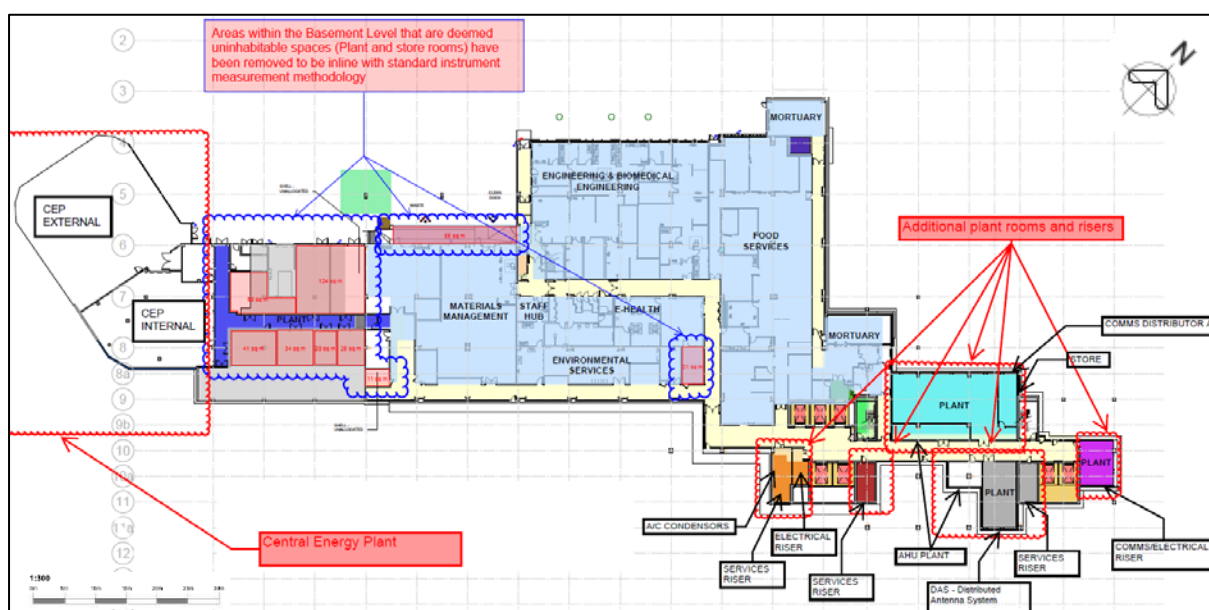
| Proposed basement plan (Source: SSD-10353-Mod-1 Modification Report, dated 16 July 2021)
